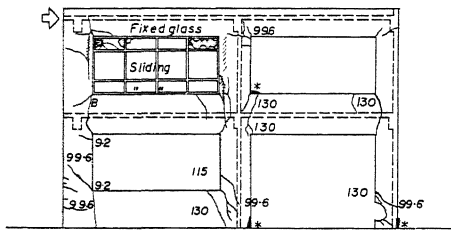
CRACK IN HAMAMATSU WALLED FRAME
